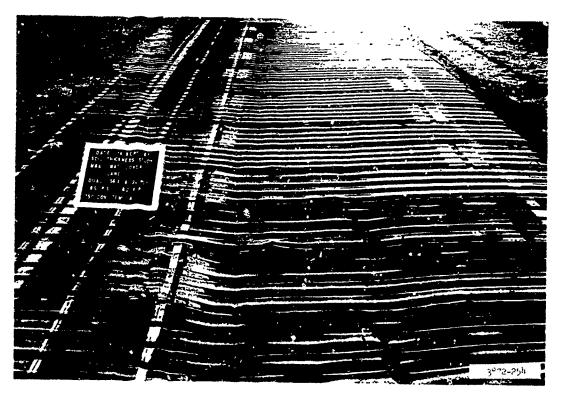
Test section I, lane 3, item 3, prior to traffic
